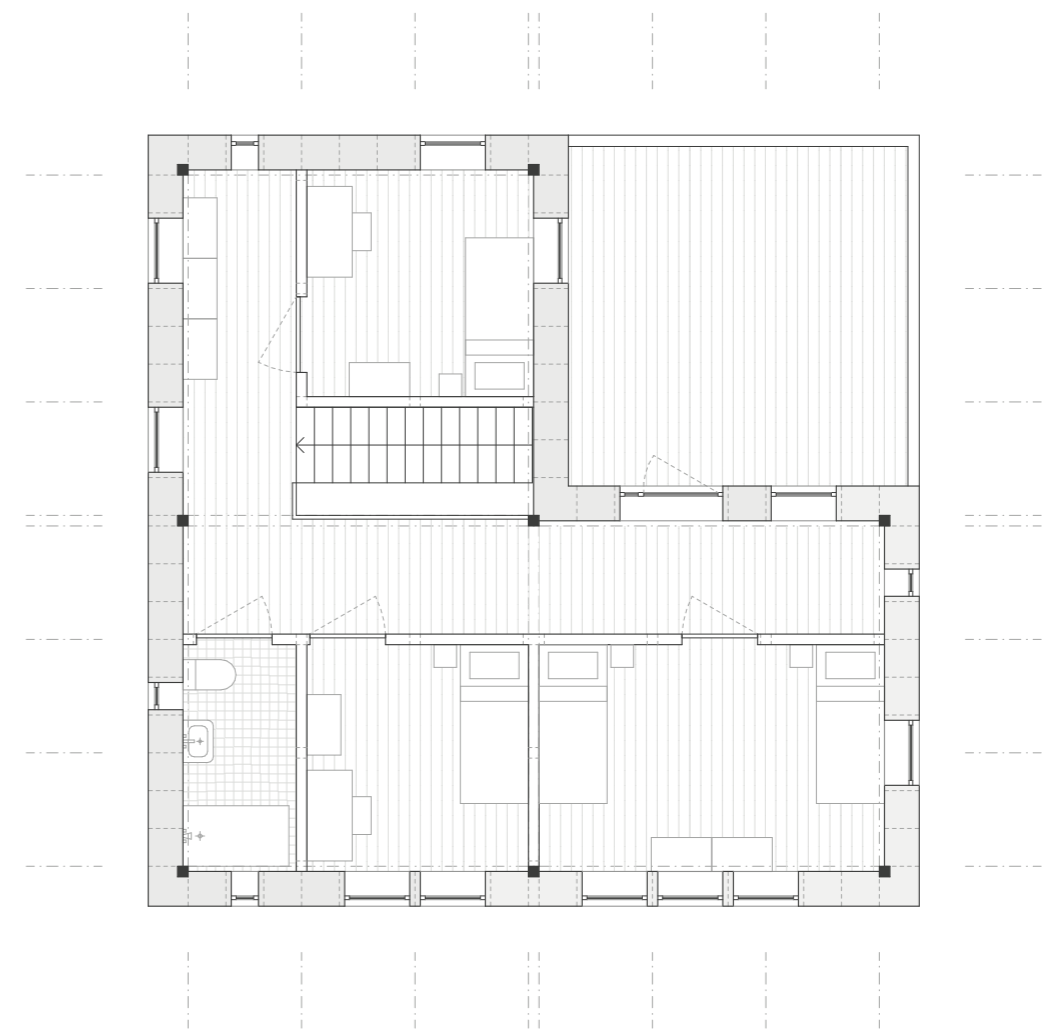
Drawing, First floor - Six persons house - 1:100. ©Personal illustration.
